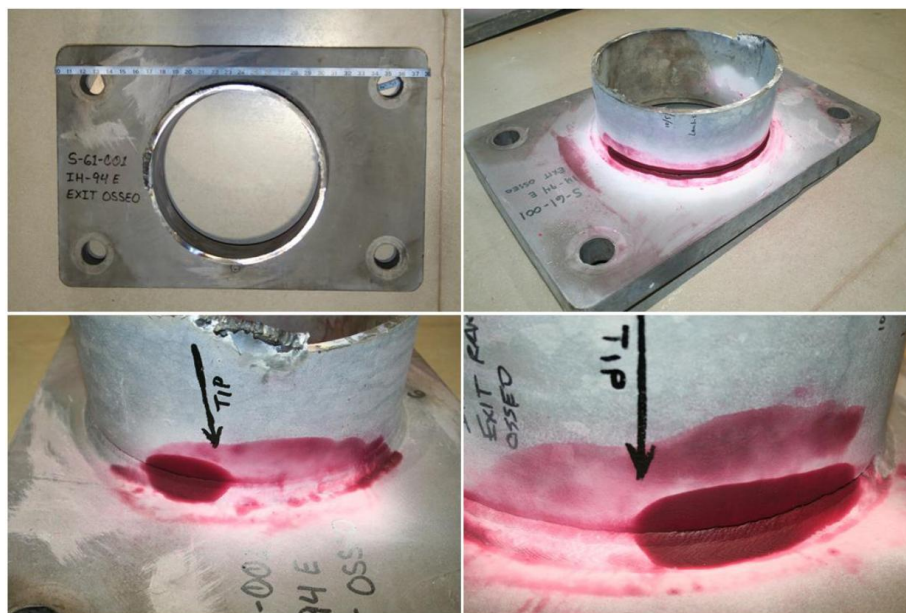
Photo montage of failed connection from S-61-0001 before and after dye penetrant testing.
